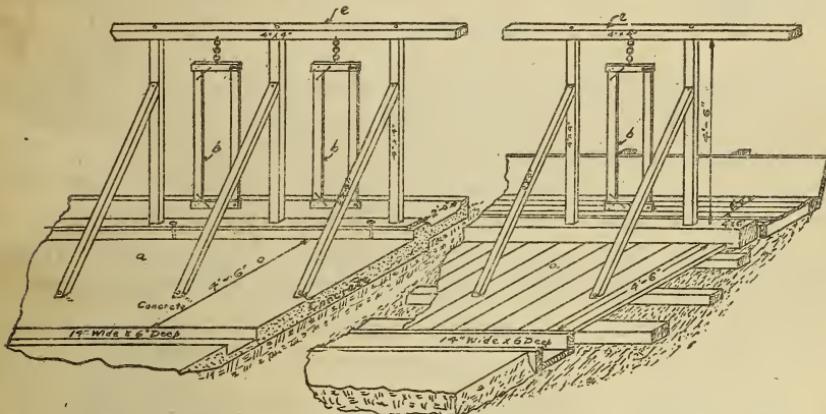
Arrangement of concrete and wooden stalls for cows.
